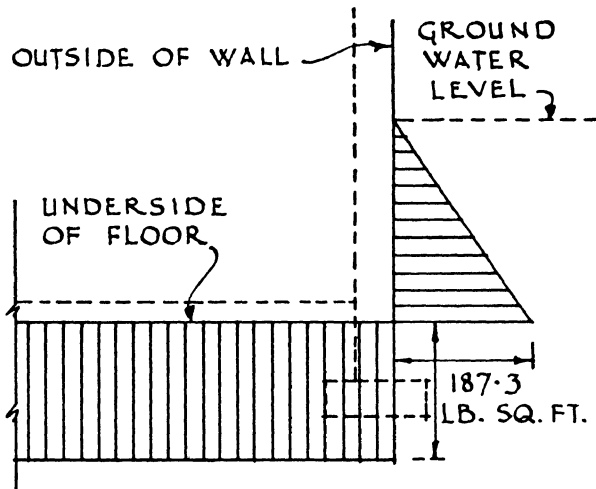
Pressure of Water on Floor and Walls of Basement.
